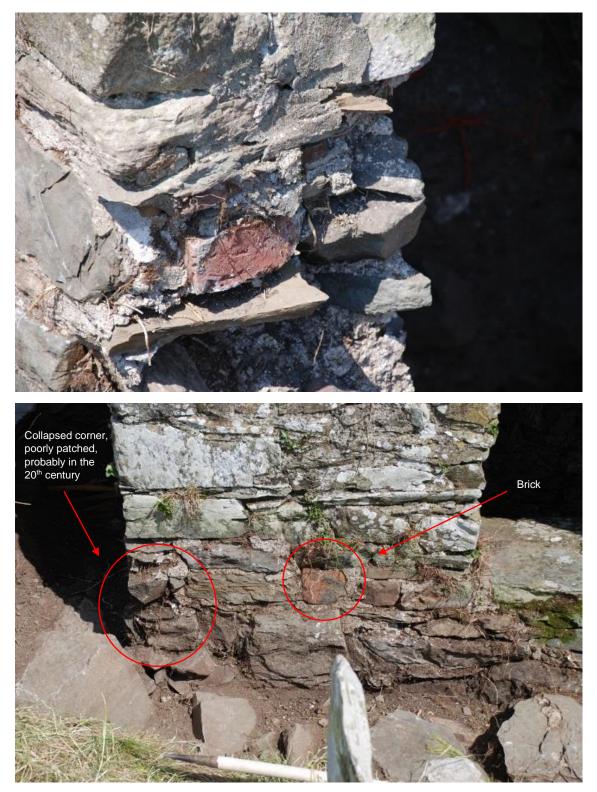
Brick used in 20th century repairs to the building, at the south-east corner (above) and in the southern façade (below).
